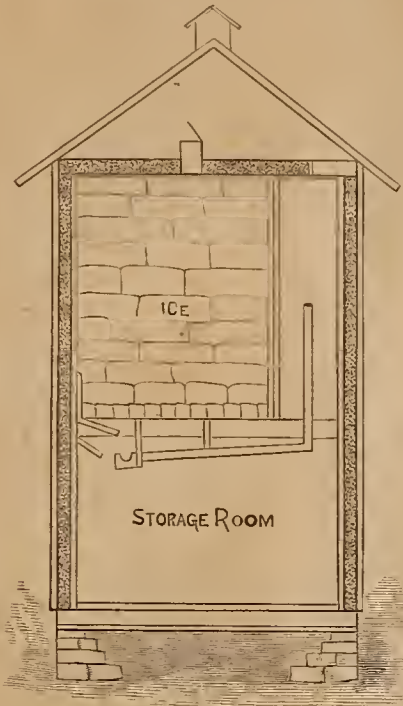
CROSS SECTION OF COLD STORAGE HOUSE.
